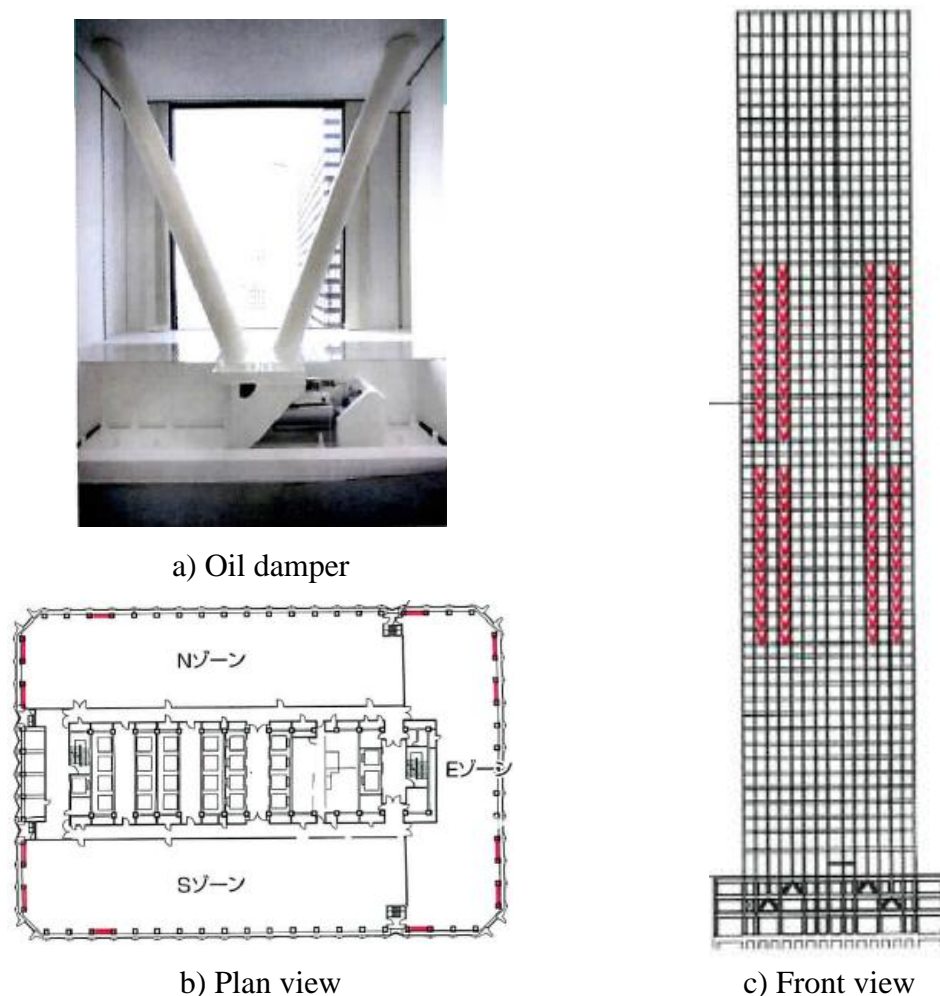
Oil damper and its distribution in Shinjuku Center Building [1-11]
